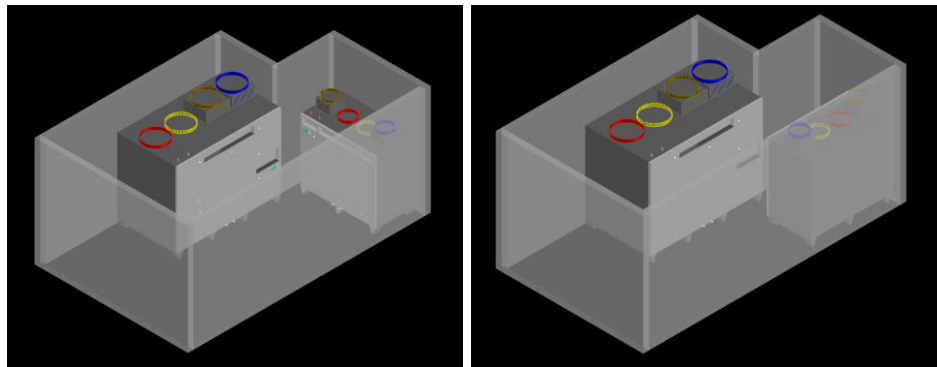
Designed arrangement of air handling units on the left (2a) and installed arrangement on the right (2b).
